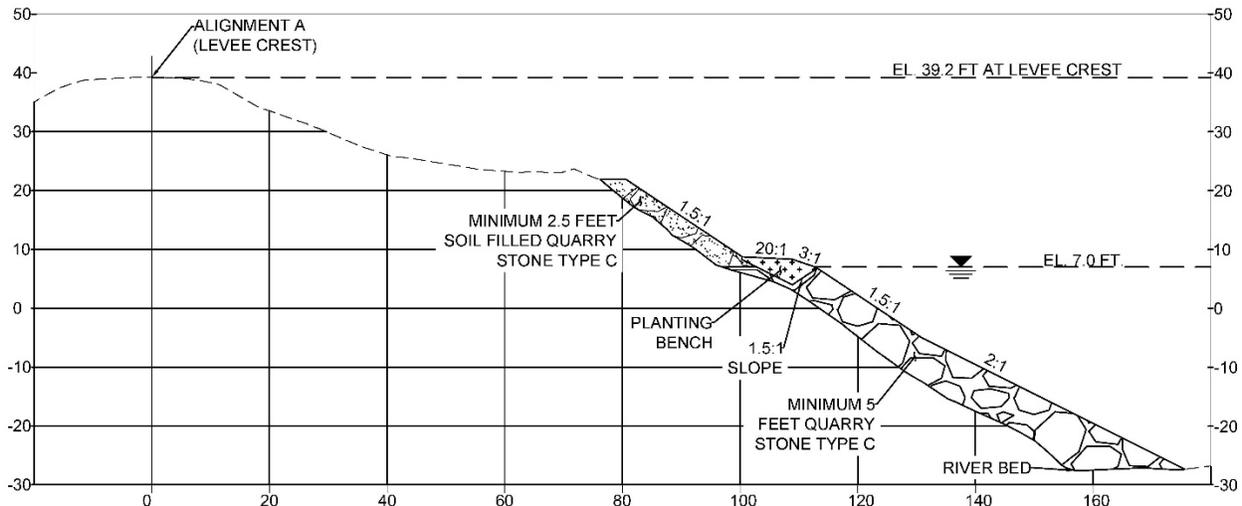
RM 55.2L Bank Protection Design Typical Cross Section.
